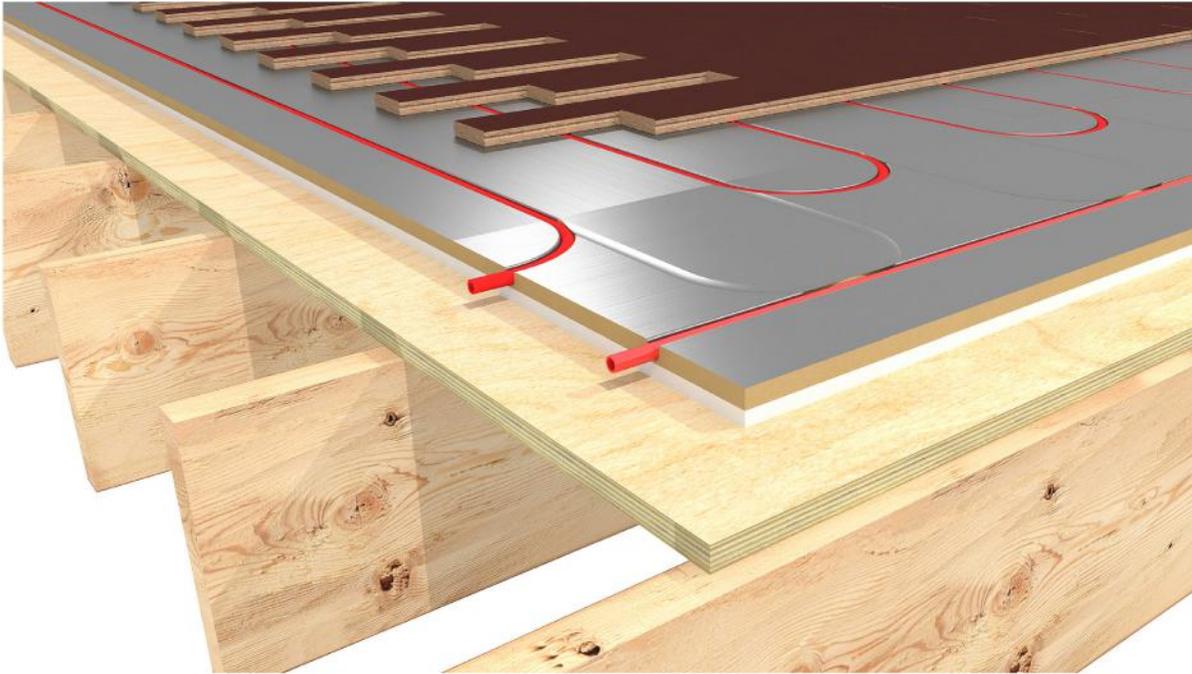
Thermalboard EPS™ installed over UNINSULATED subfloor
